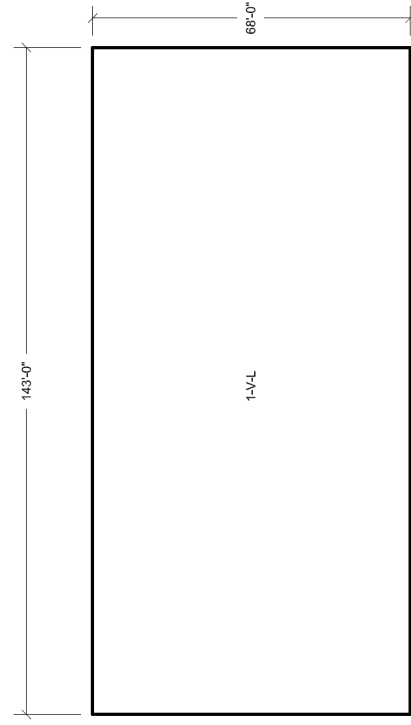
H.6.54-PUMP HOUSE NORTH WALL LOOKING SOUTH
